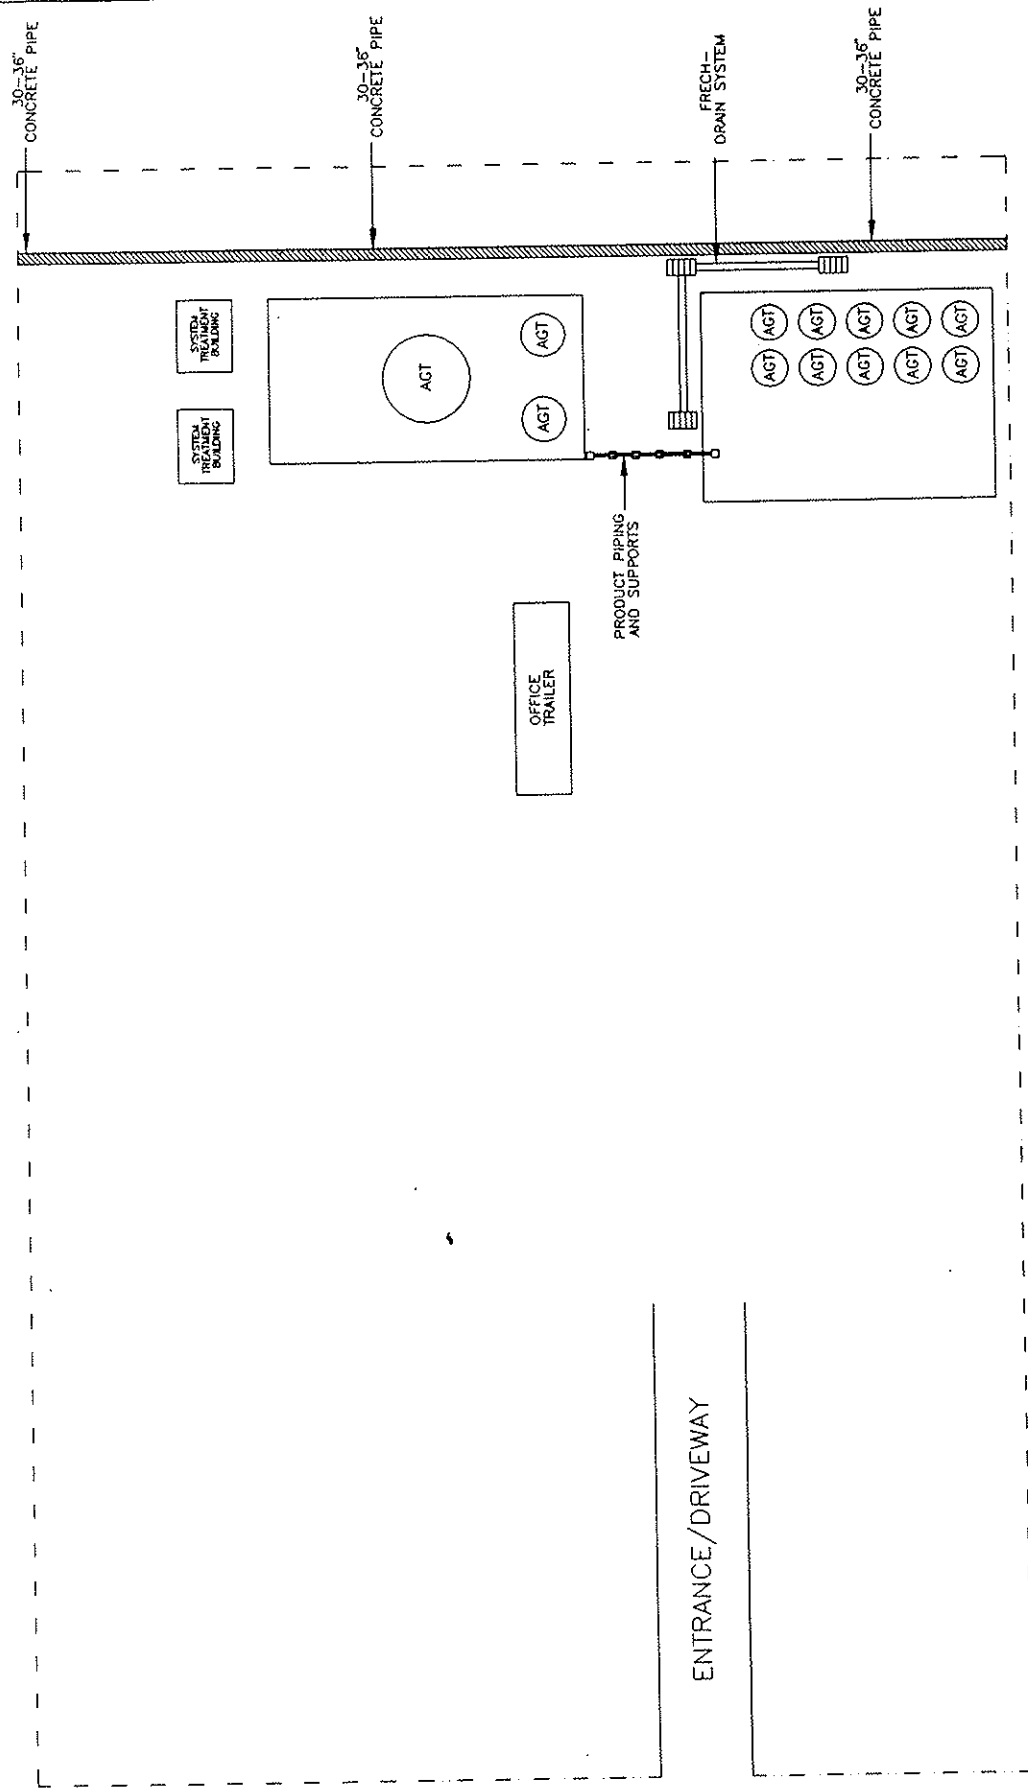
SITE MAP WITH CONCRETE PIPE LOCATION
